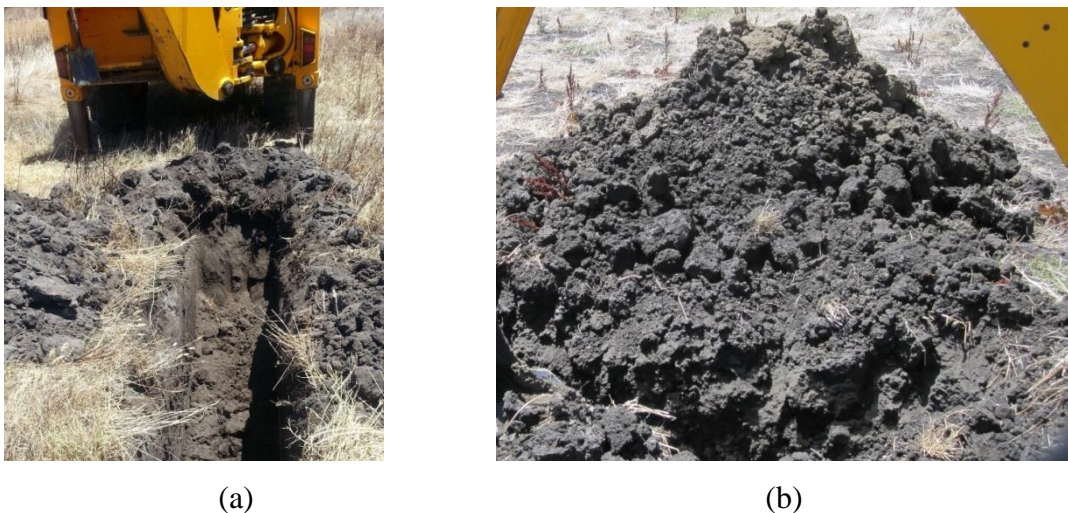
Sampling procedure: (a) test pit wall and (b) soil spoil
